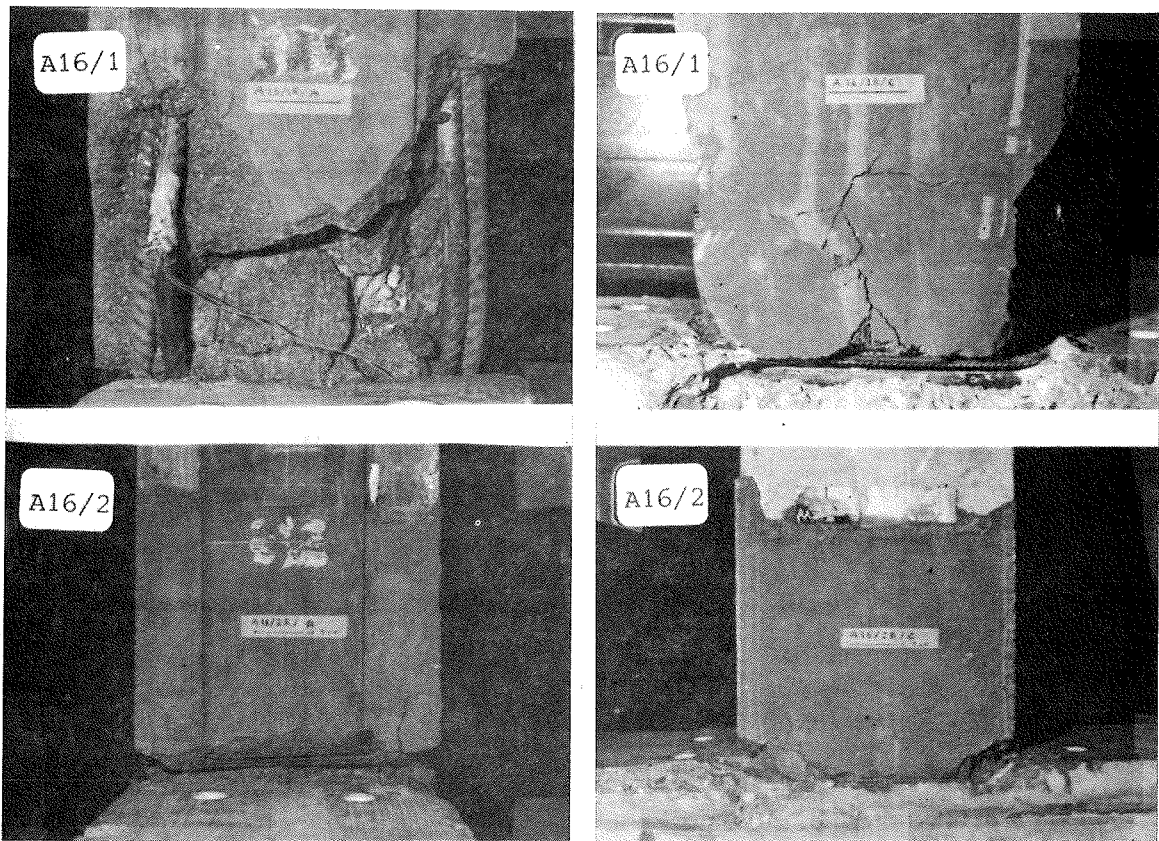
Specimens A 16/1 and A 16/2 after second test (sides A and C, cf. Fig. 1).
